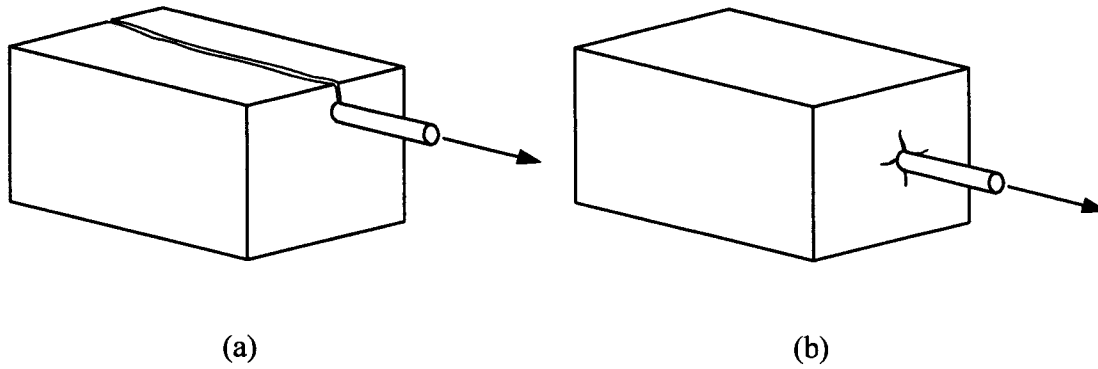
Bond failure modes of reinforcing bar: (a) Splitting failure; (b) Pullout failure
